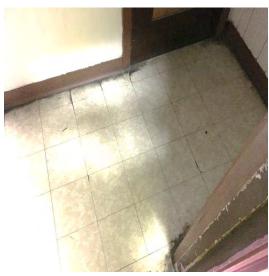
View of non-asbestos floor tile on top of plywood and VAT.
